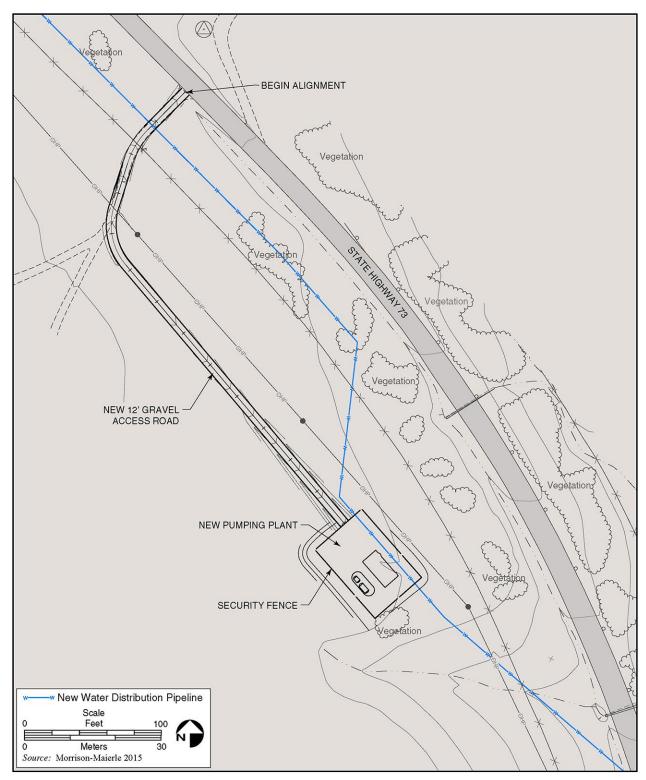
Construction Plans for the Proposed Cedar Creek Pump Station
